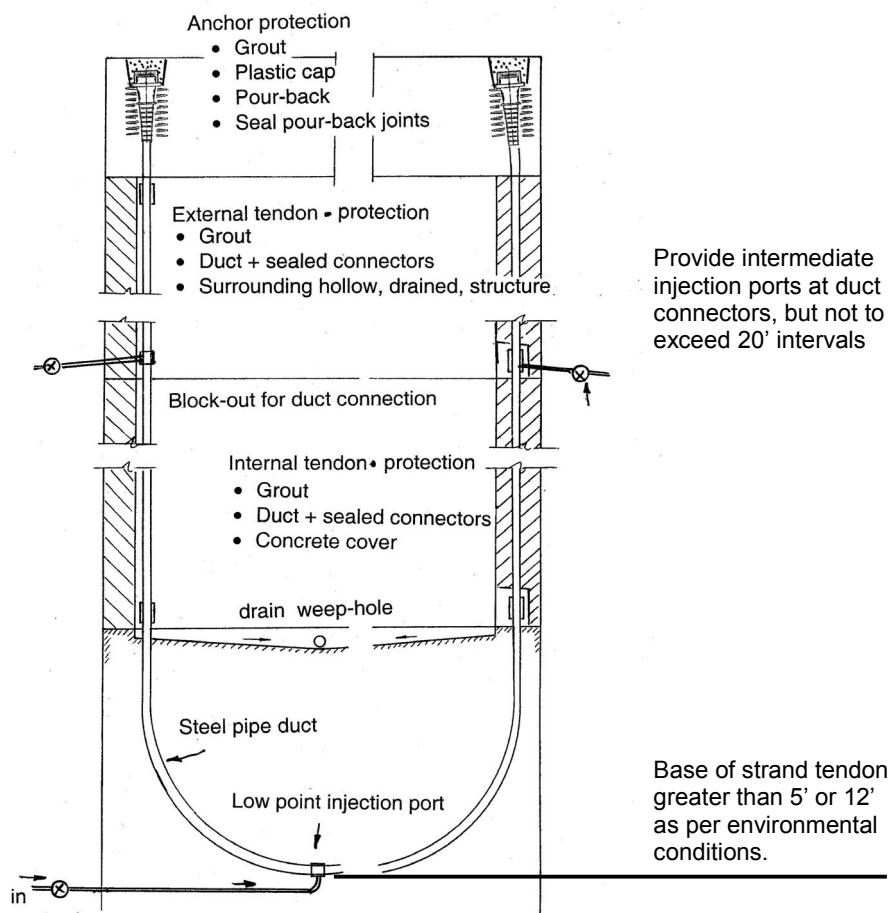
Grouting and anchor protection of vertical tendons in hollow precast piers.
